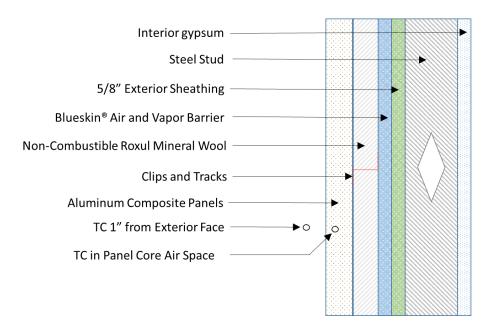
Instrumentation Arrangement – Profile View System (TCs on Exterior Face and Within Wall Core).
